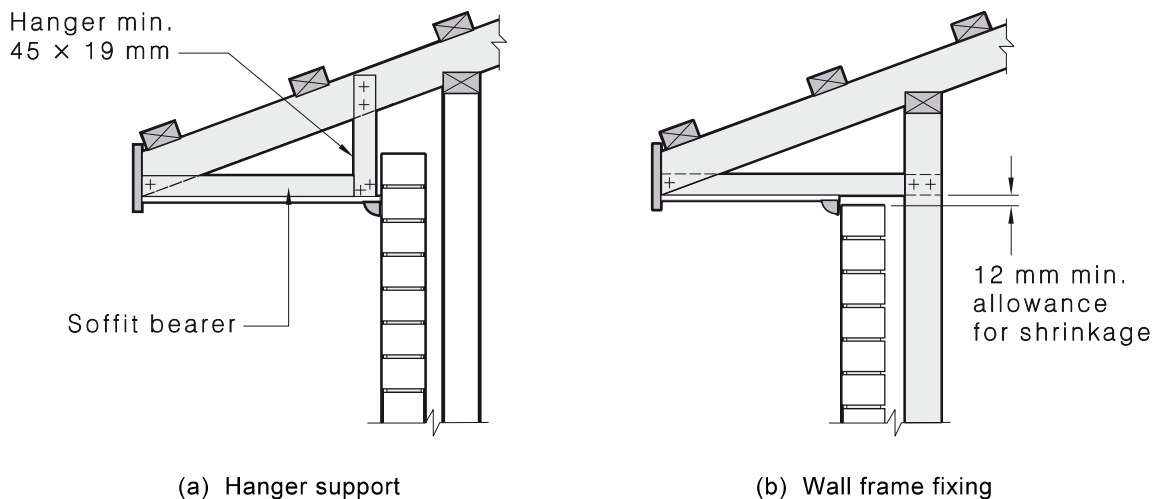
TYPICAL BOXED EAVES CONSTRUCTION
